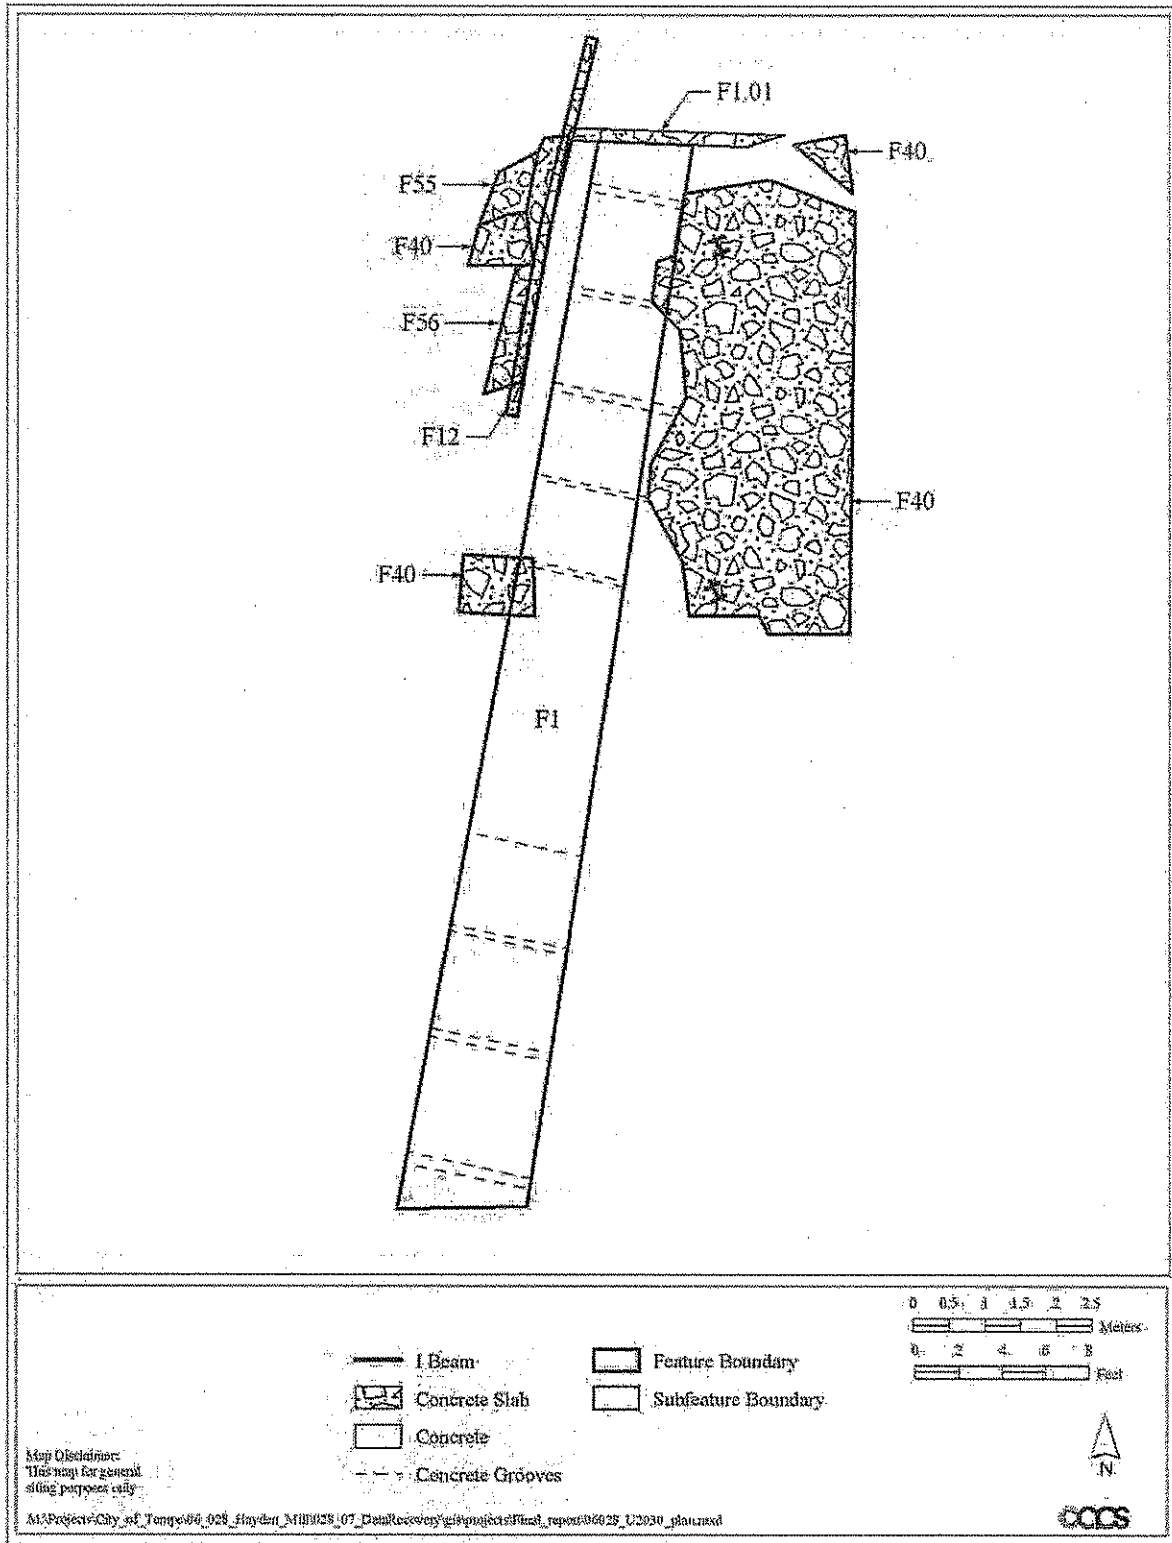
Plan view of concrete culvert Feature 1 and headwall Feature 1.01, Hayden Ditch Site (AZ U:9:189[ASM]).
